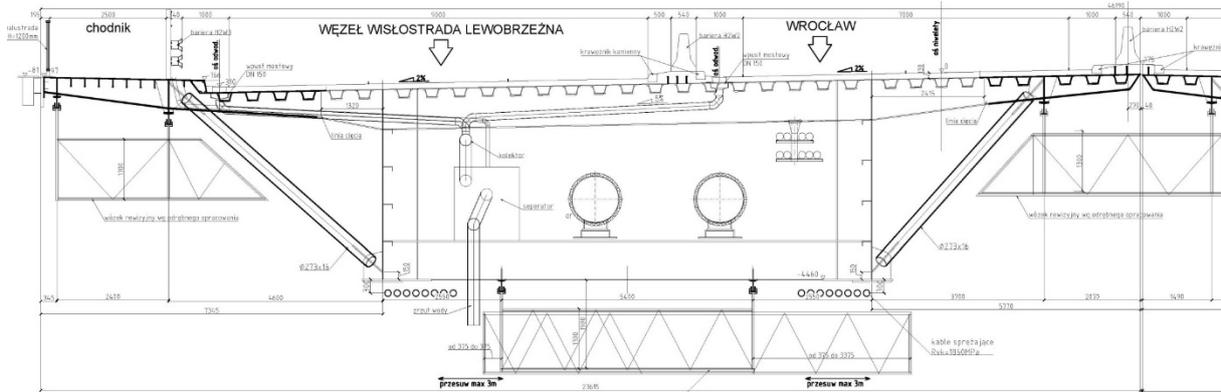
Cross section of the Grot- Rowecki's bridge in Warsaw after modernisation works
